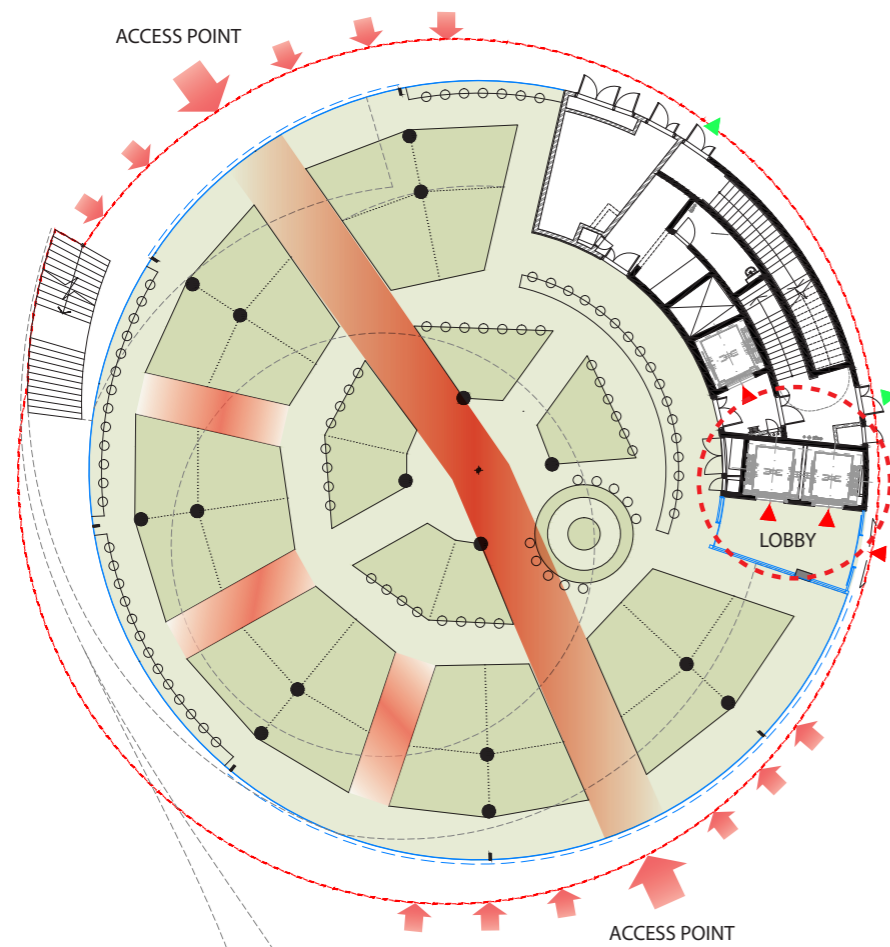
DA Ground Floor Plan - Indicative Market Hall Fit Out
